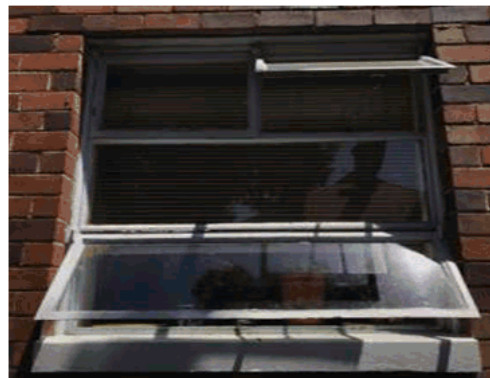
Broad steel awning windows to kitchen. (Author photo)
